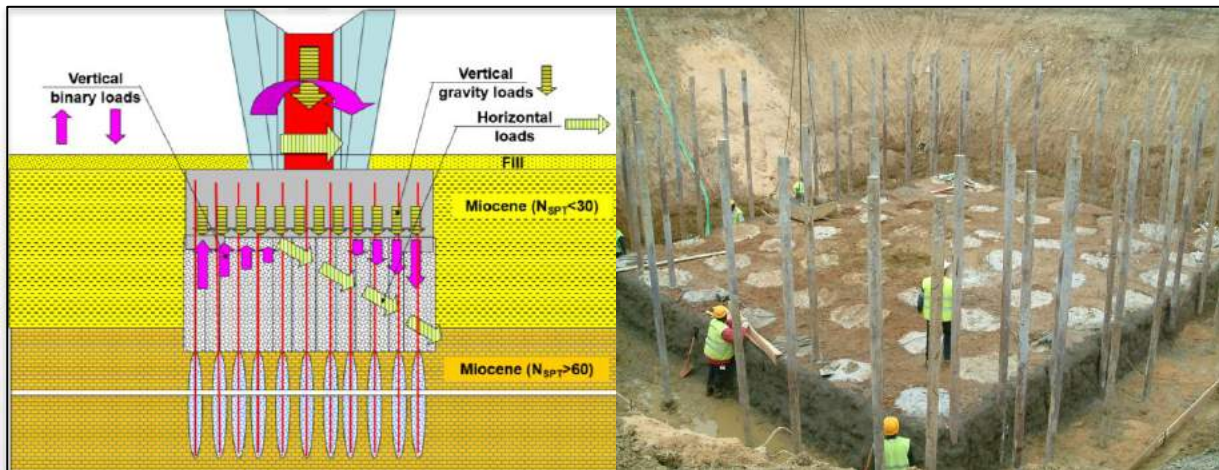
Cross section of the adopted solution with loads transition scheme and view of the jet grouting columns under the future footing.
